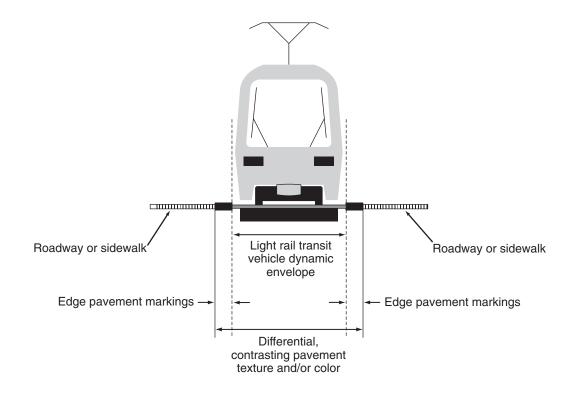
C-9. Typical Light Rail Transit Vehicle Dynamic Envelope Pavement Markings
